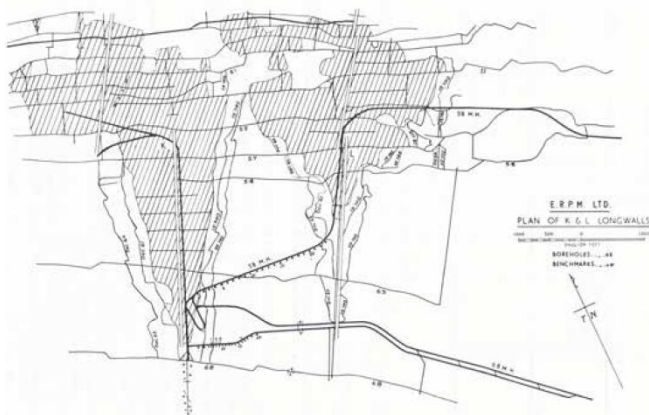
The K (left) and L (right) longwalls at ERPM Mine and the position of the 58 level hangingwall haulage where Ryder and Officer (1964) conducted measurements. This is a plan view of the mine workings
